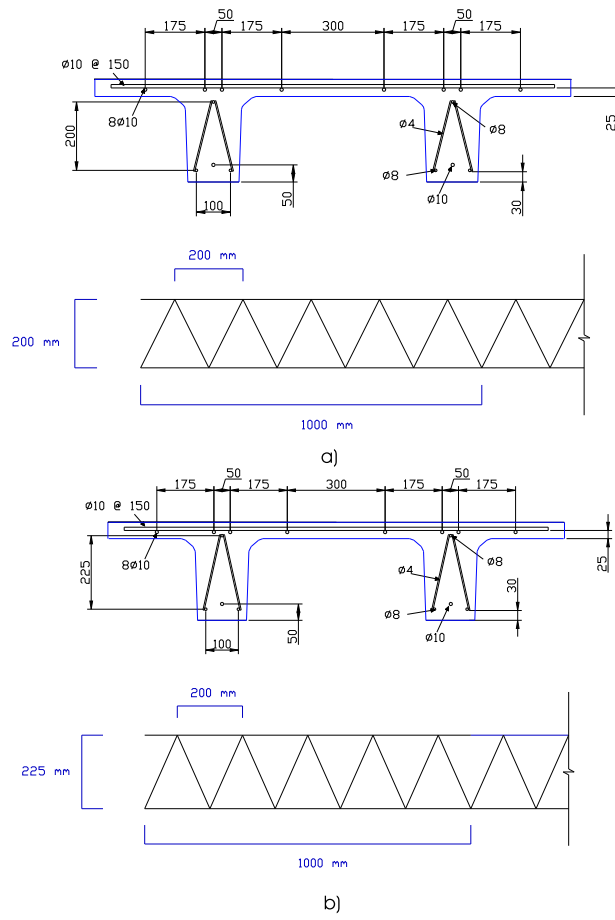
One way slabs cross-sections. a) Type 1 beam, b) Type 2 beam.
